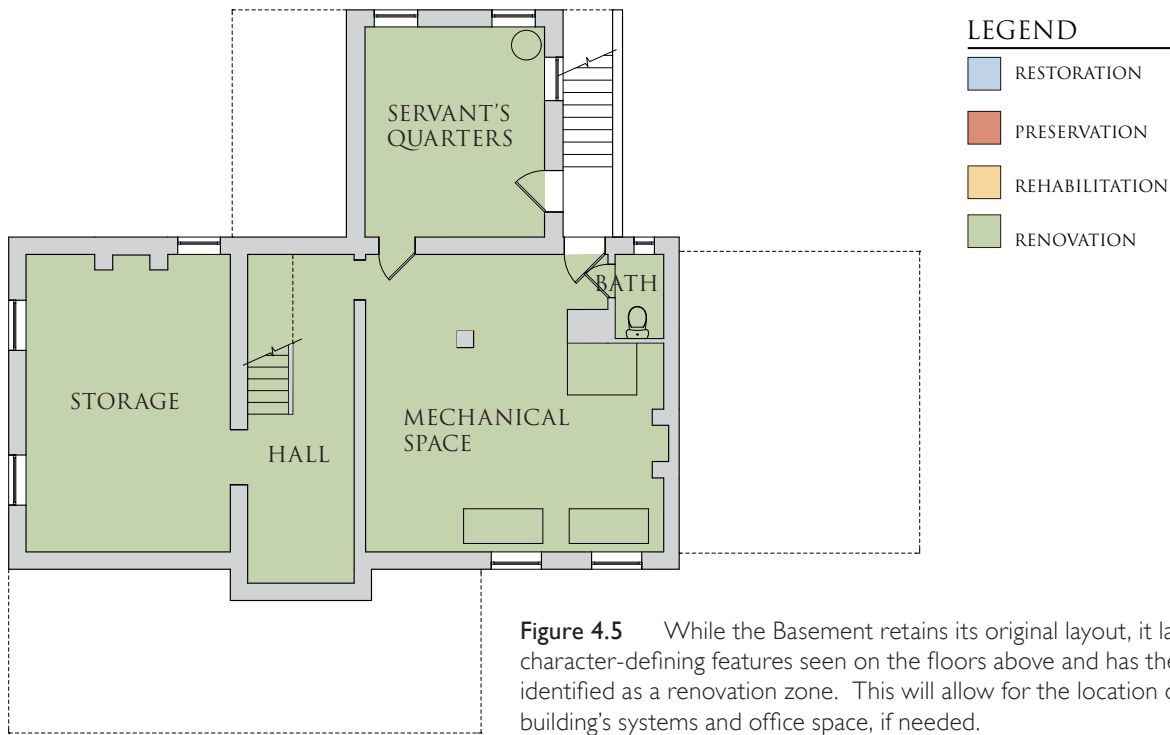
While the Basement retains its original layout, it lacks the character-defining features seen on the floors above and has therefore been identified as a renovation zone. This will allow for the location of many of the building's systems and office space, if needed.
